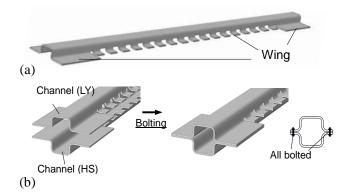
New NBB design: (a) Channel with wing; (b) Connection of channels using bolts
